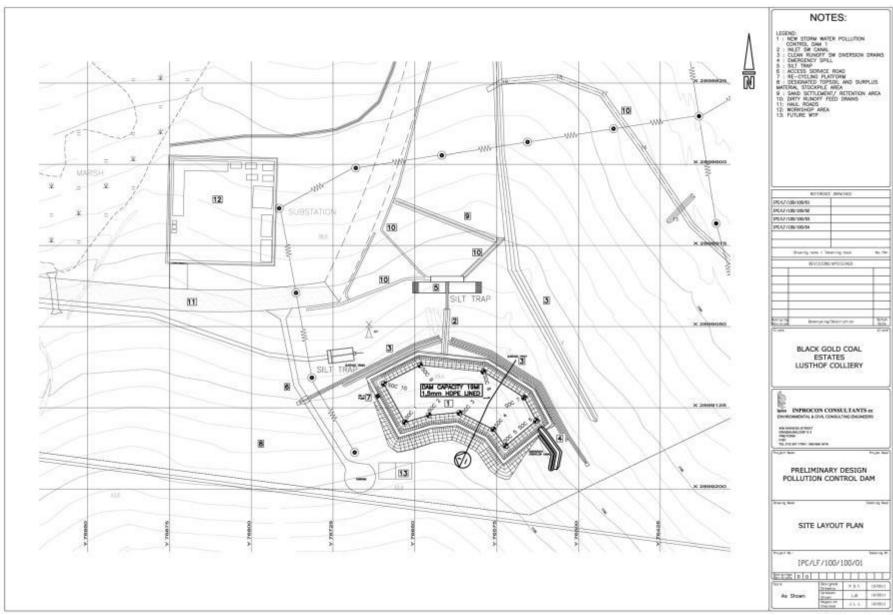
(a): Pollution Control Dam - Site Layout Plan.
